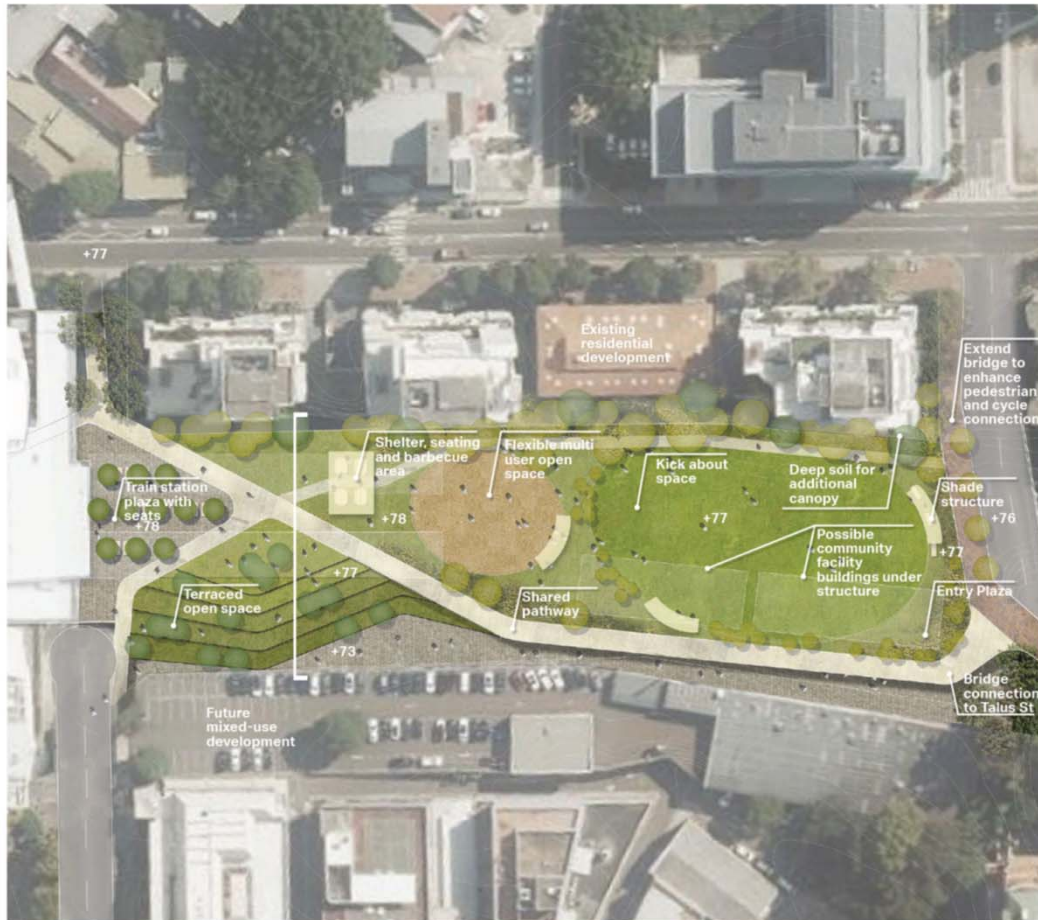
Platform Park Concept Plan (Source: AECOM, 2018)
